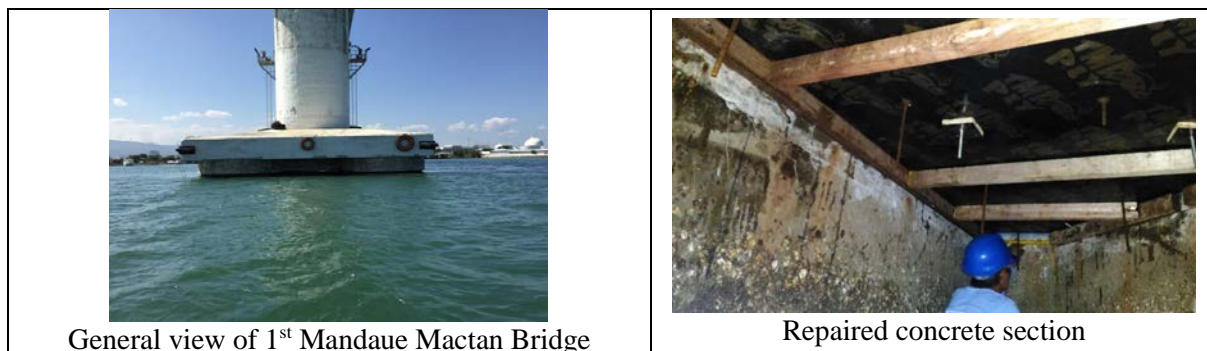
1st Mandaue Mactan Bridge and Repair Work of RC Structure
